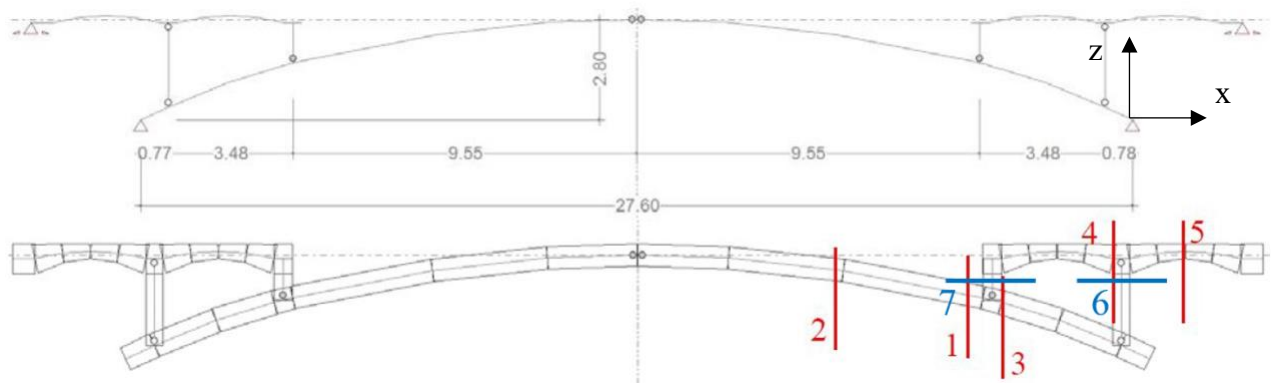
2-D bar model of the Guillermaux bridge and critical sections for verification [m]
